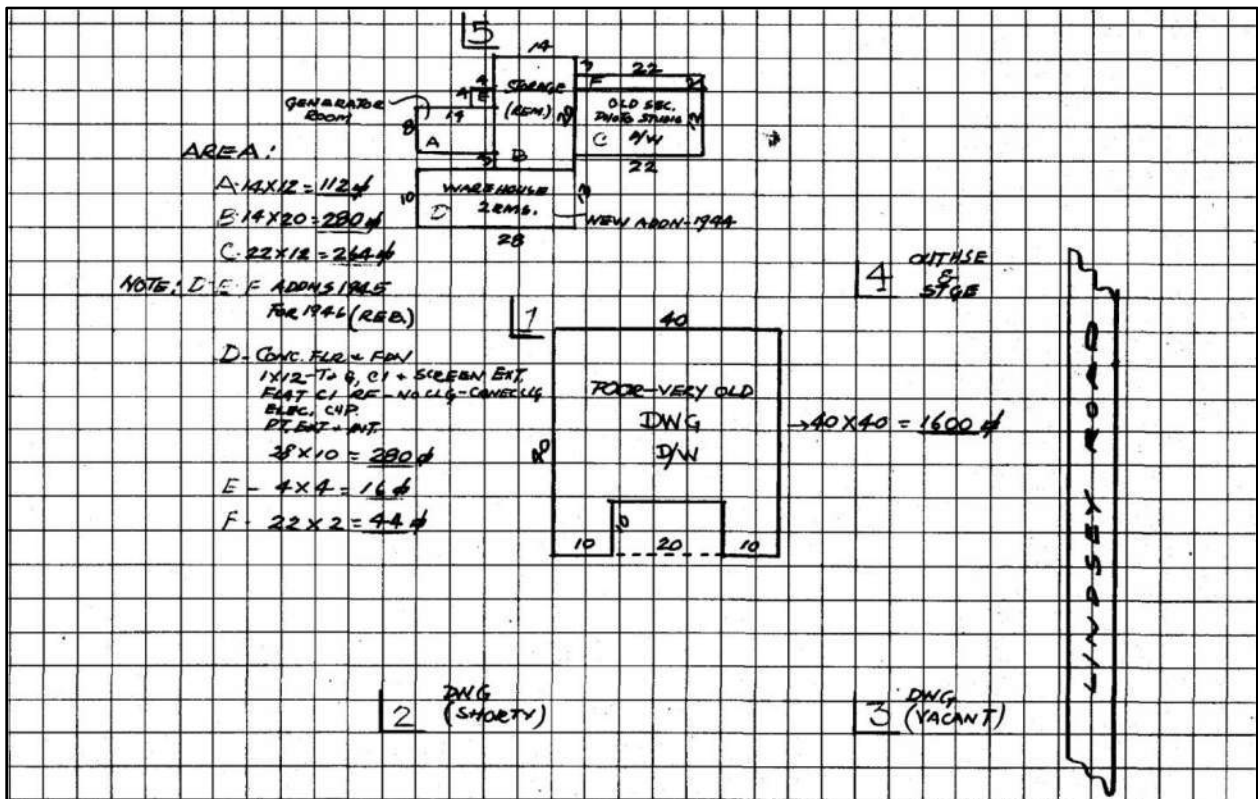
Detail of TMK (3)6-5-03:05 Field Book Building Sheet showing schematic layout of buildings.
